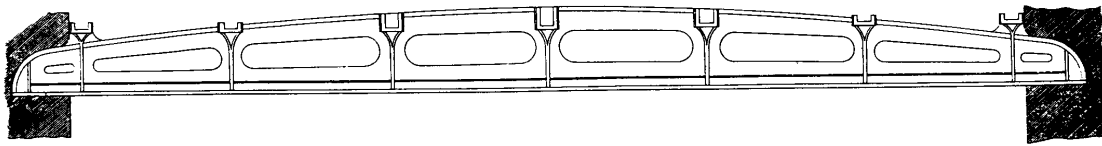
Elevation of cast iron girder used in the King’s Library, British Museum in the early 1820s (source: Thorne 1980, 27)
